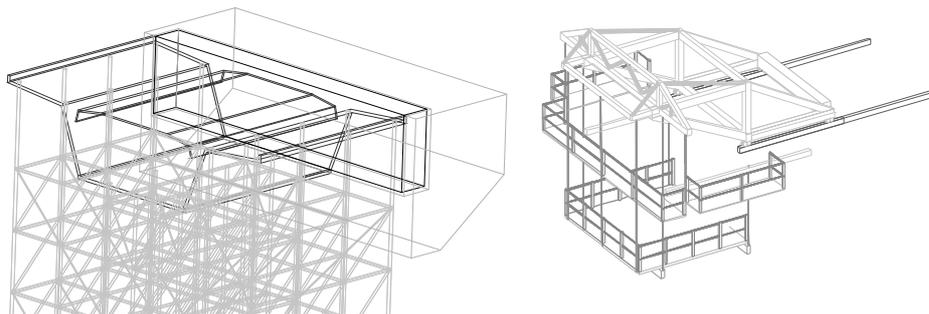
3D models of the abutments, false work, scaffolding and advanced equipment.
